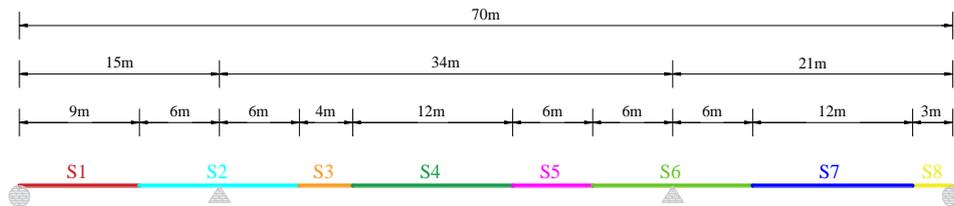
Topology, support conditions and pre-built segment locations of the composite steel box girder bridge
